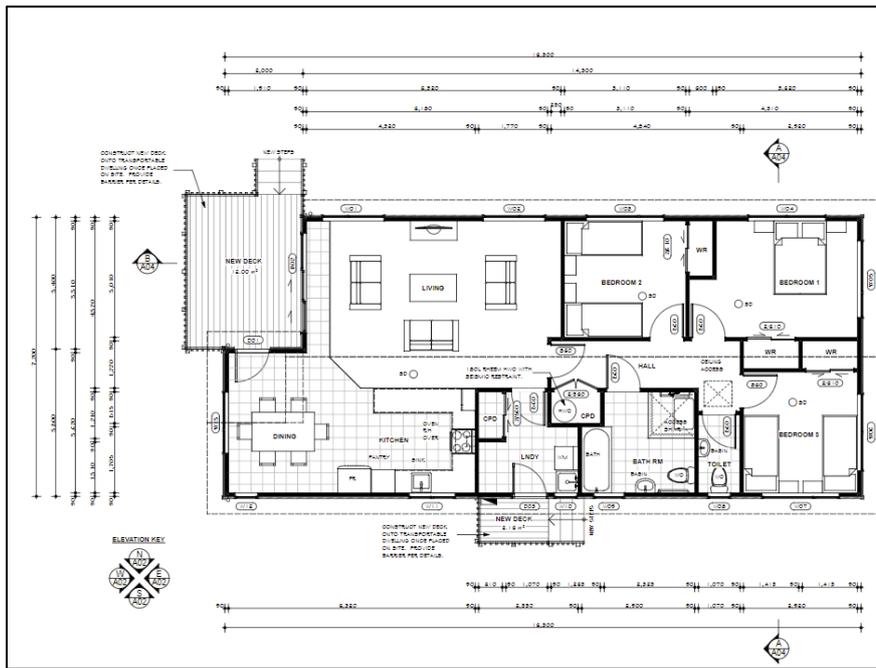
Proposed Floor Plan (3-bedroom dwelling)
